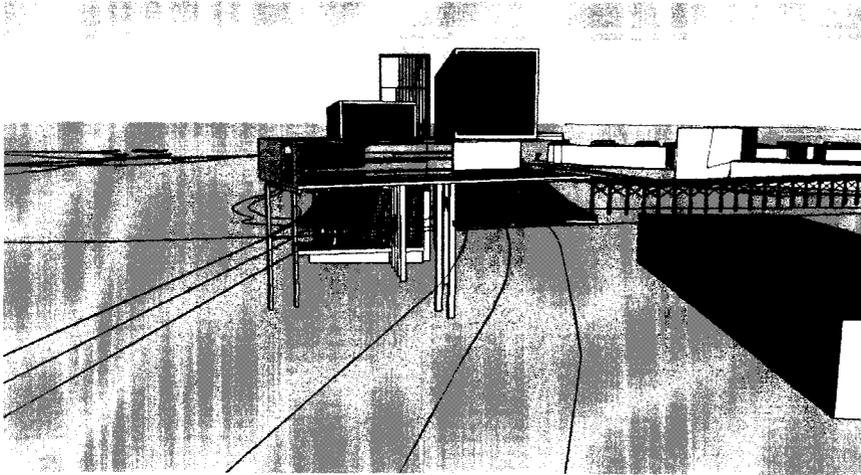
Bayview Terminal Building looking towards the downtown core of Ottawa and Parliament Hill.
